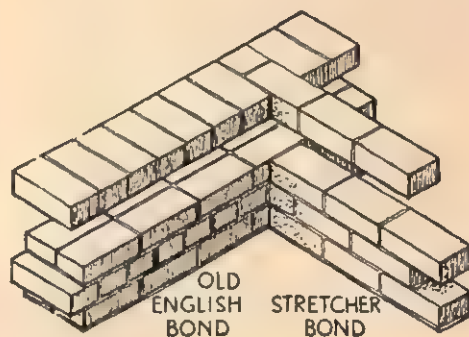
Bonds used in brick walls. Why are the lower bonds not used in cavity walls?
